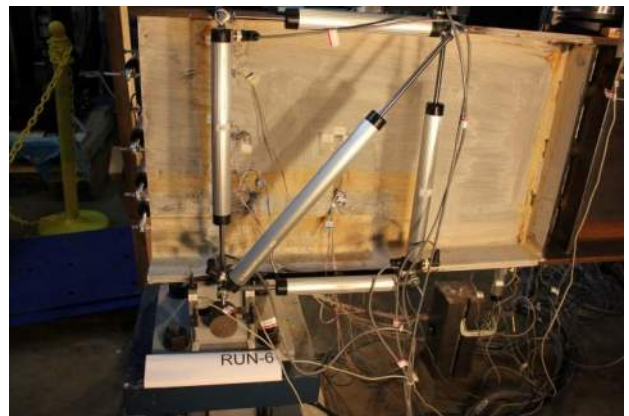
Damaged Girder Right: 24 kip
